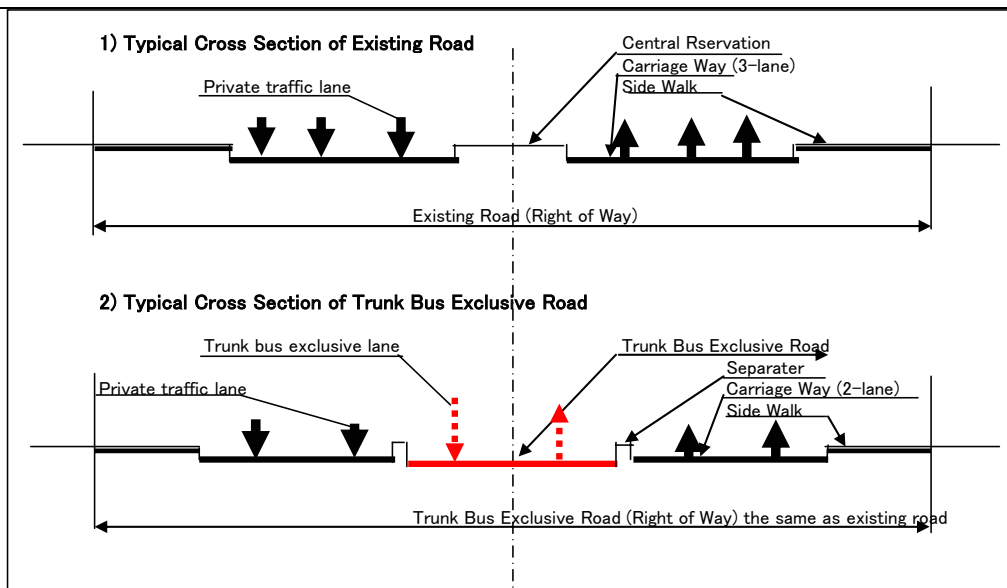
Typical Cross Section of Exclusive Trunk Busway
